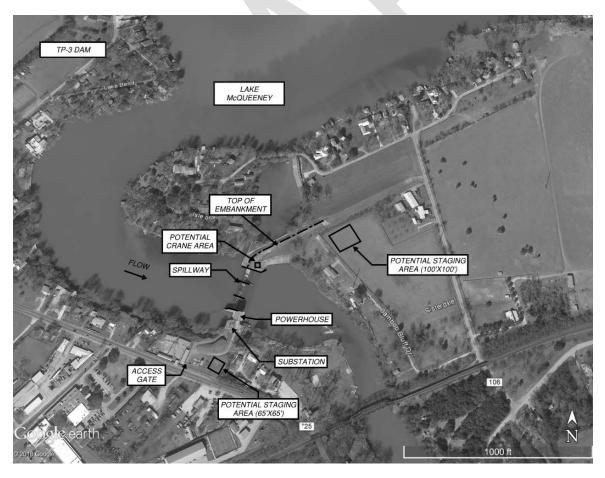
TP-3 (Lake McQueeney) Spillway Site Plan
